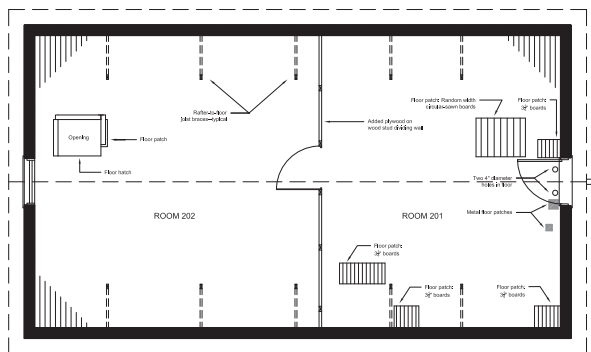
Plan of loft showing possible stair opening and hay drops, all now patched. Existing open hatch is near northwest corner.
